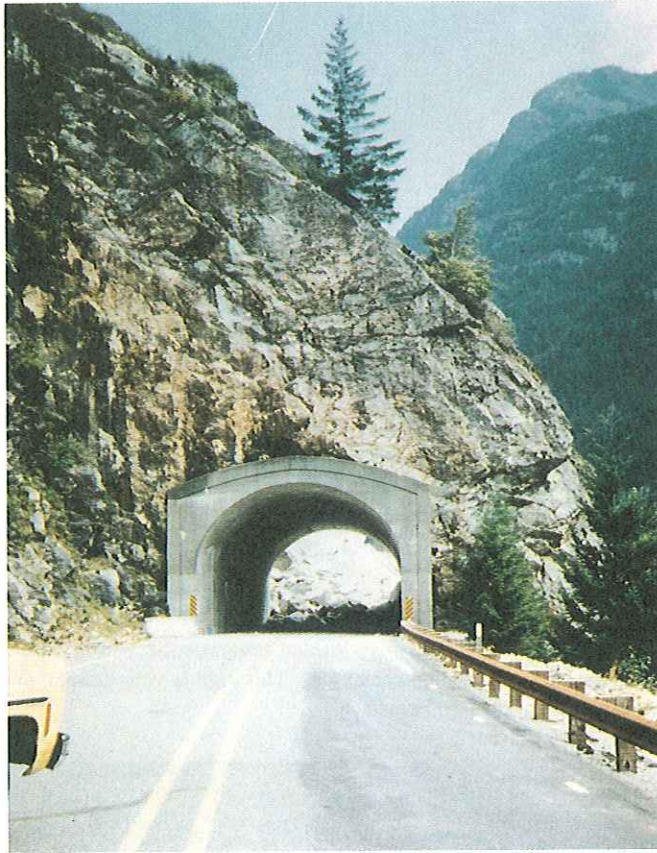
Concrete-lined tunnel in rock. The portal must extend out from the rock face a sufficient distance to ensure rock does not fall over the portal onto the highway (Courtesy Washington Department of Transportation).
